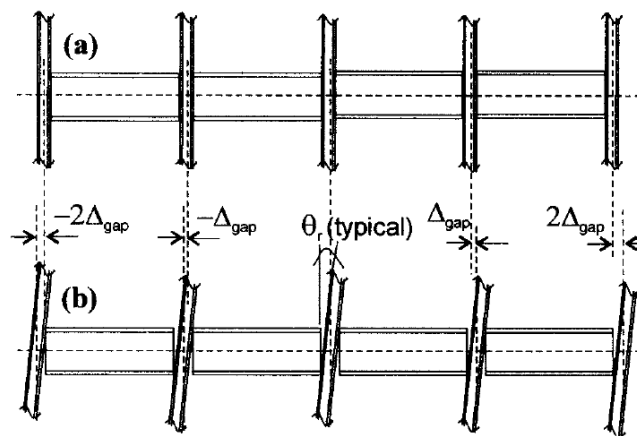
Elevation of post-tensioned steel frame: (a) not deformed, (b) deformed (Garlock et al. 2007).
